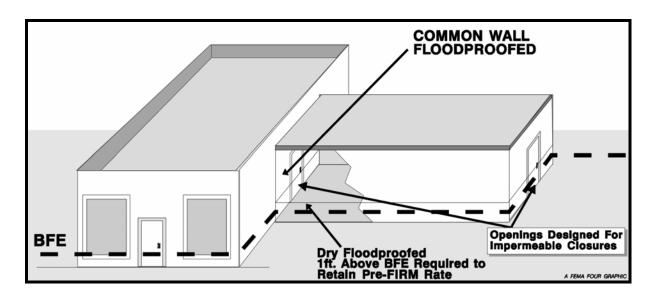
Lateral addition to a nonresidential building. The structure would *not* benefit from post-FIRM flood insurance rates because the original building was not elevated or floodproofed.
